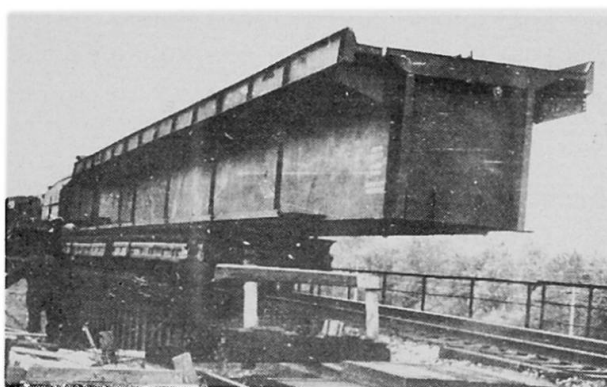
Box girder superstructure coated with stainless steel protecting ballast bed from corrosion
